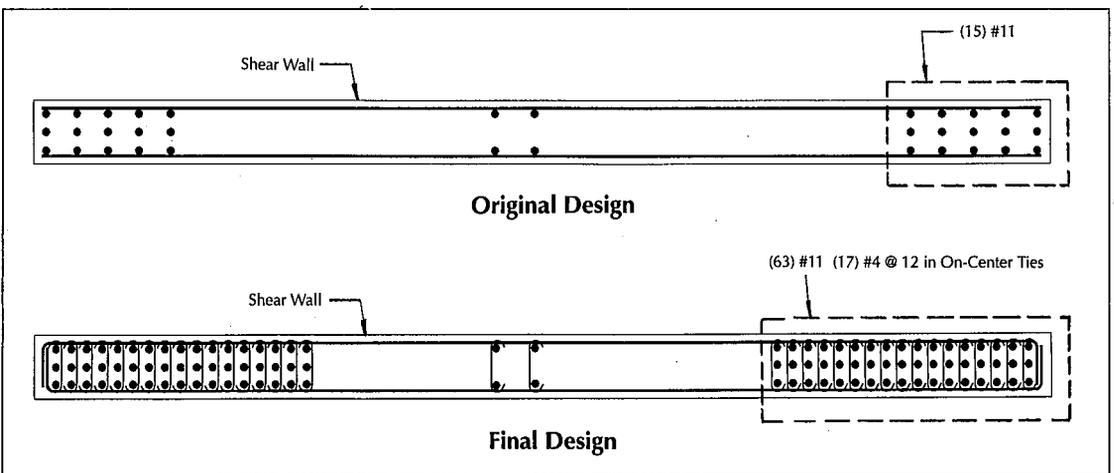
Shear walls were redesigned to account for compressive forces.
